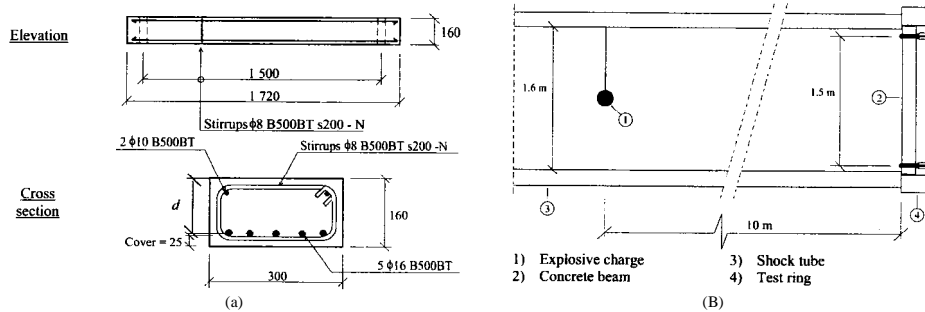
(a) Dimensions (in mm) of tested reinforced concrete beam; (b) Experimental set-up of the air blast tests.
